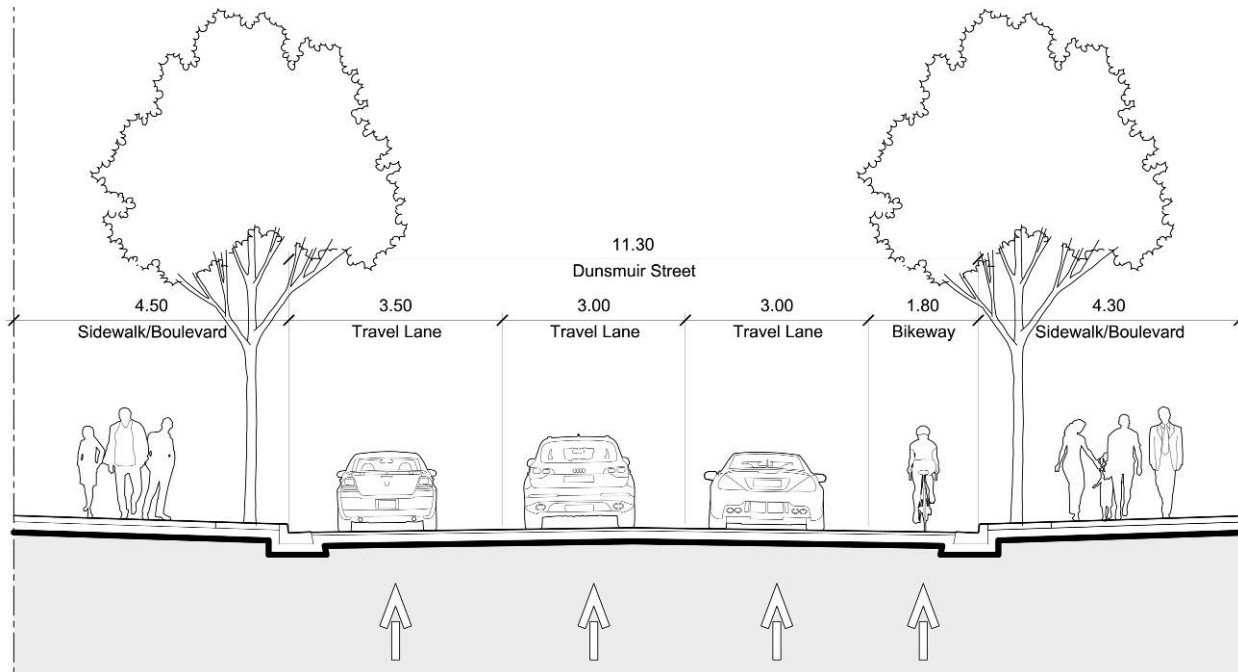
Existing cross-section of Dunsmuir Street between Richards and Hornby Streets (looking west)
